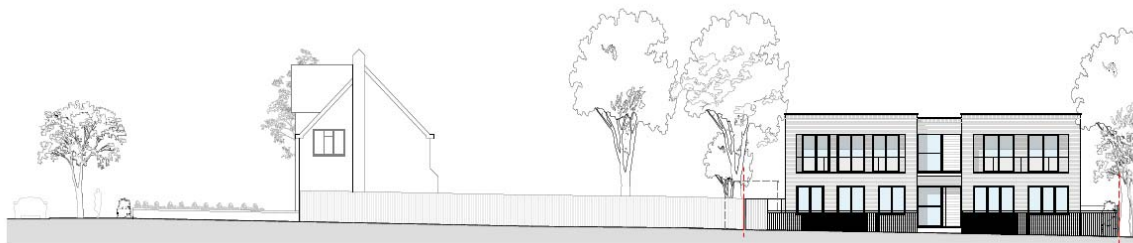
Front Elevation of the proposed development and flank elevation of the host property, 59 Rectory Park
